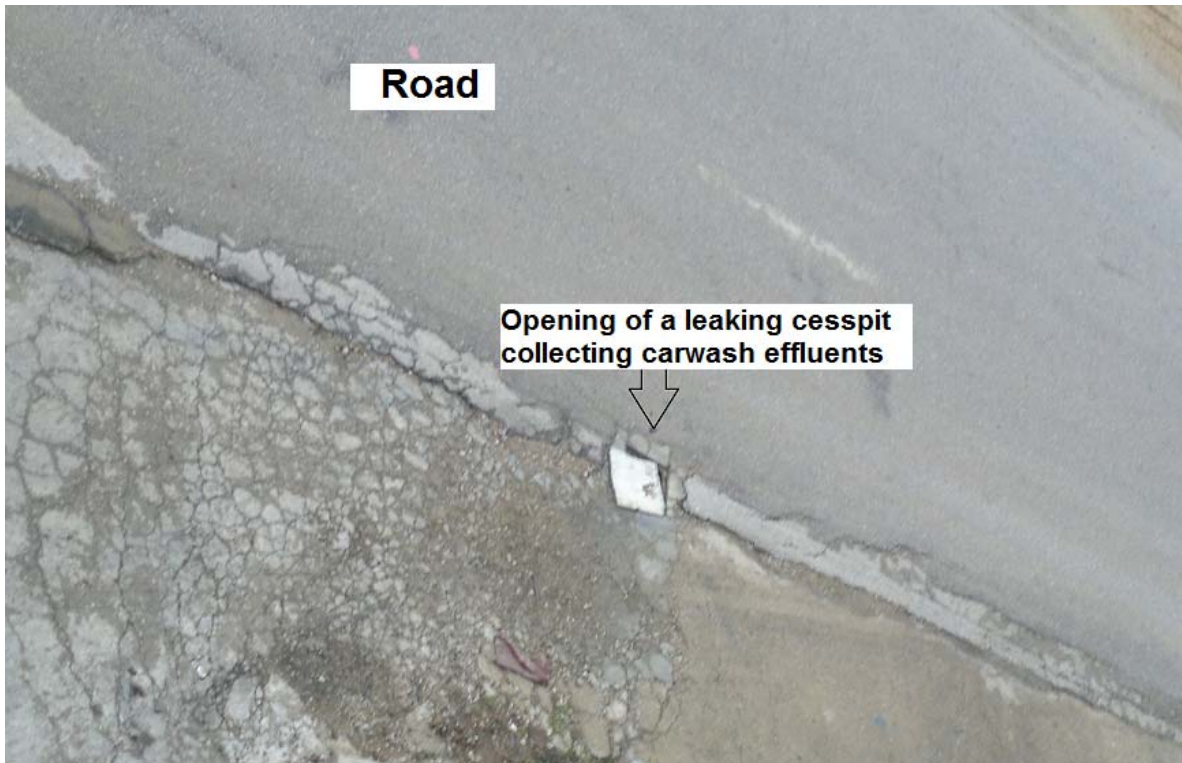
Opening of the cesspit collecting carwash effluents, located on a road's limits.
